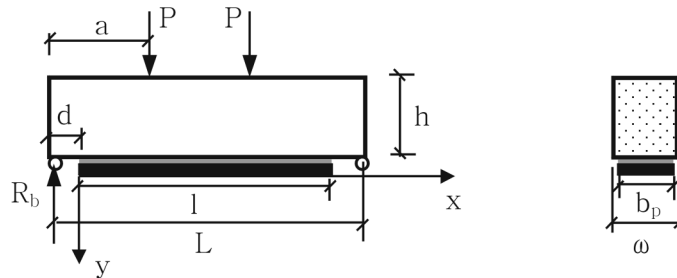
Schematic of the simply supported FRP reinforced concrete beam
